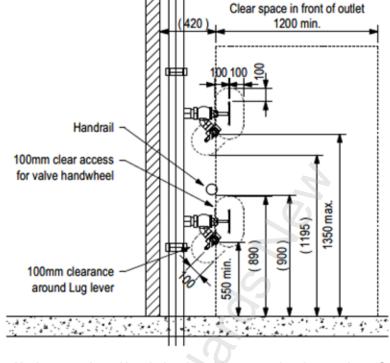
(c) – Hydrant outlet – Handwheel and Lever action lug outlet – Section view
